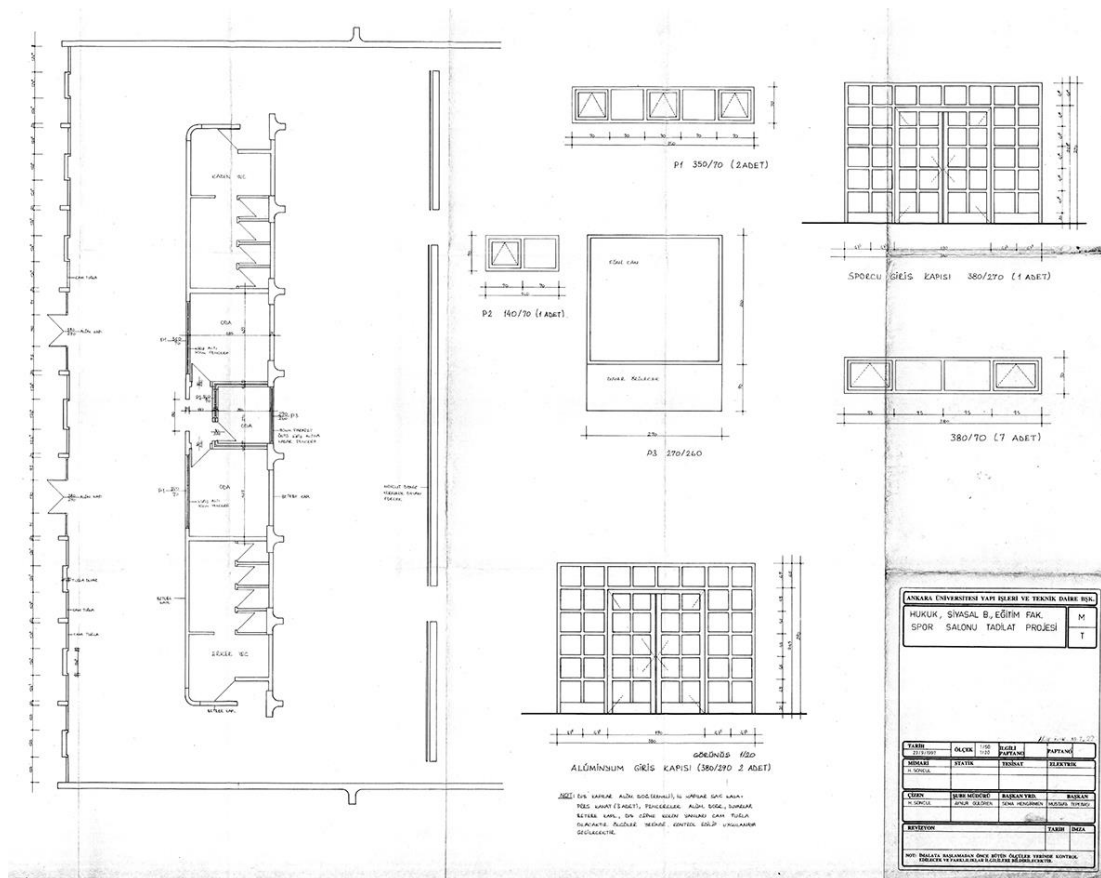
Rearrangement projects for the locker rooms and renewal of the doors and windows in the Sports Hall building (archive of Ankara University Directorate of Construction and Technical Works)
